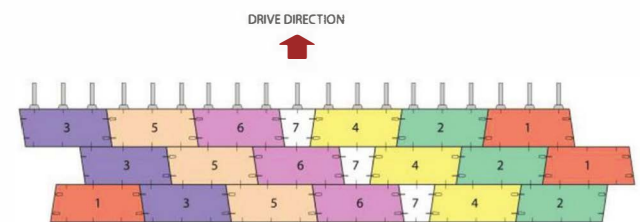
Rhomboidal or parallelogrammatical and trapezoidal systems developed plan.
